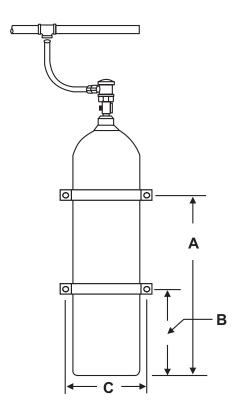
Typical 1040 and 2300 cu. in. Pilot (Driver) Cylinder Strap Installation (P/N 90-101040-000 and 90-102300-100)
